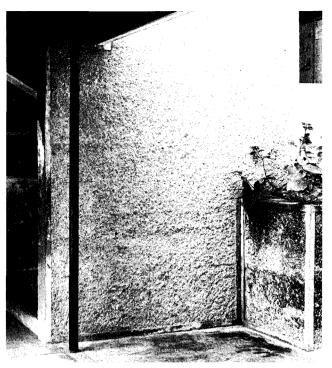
Tooled concrete wall, Faculty of Architecture, U.S.T. Architect: L. CHRISTIANS.
